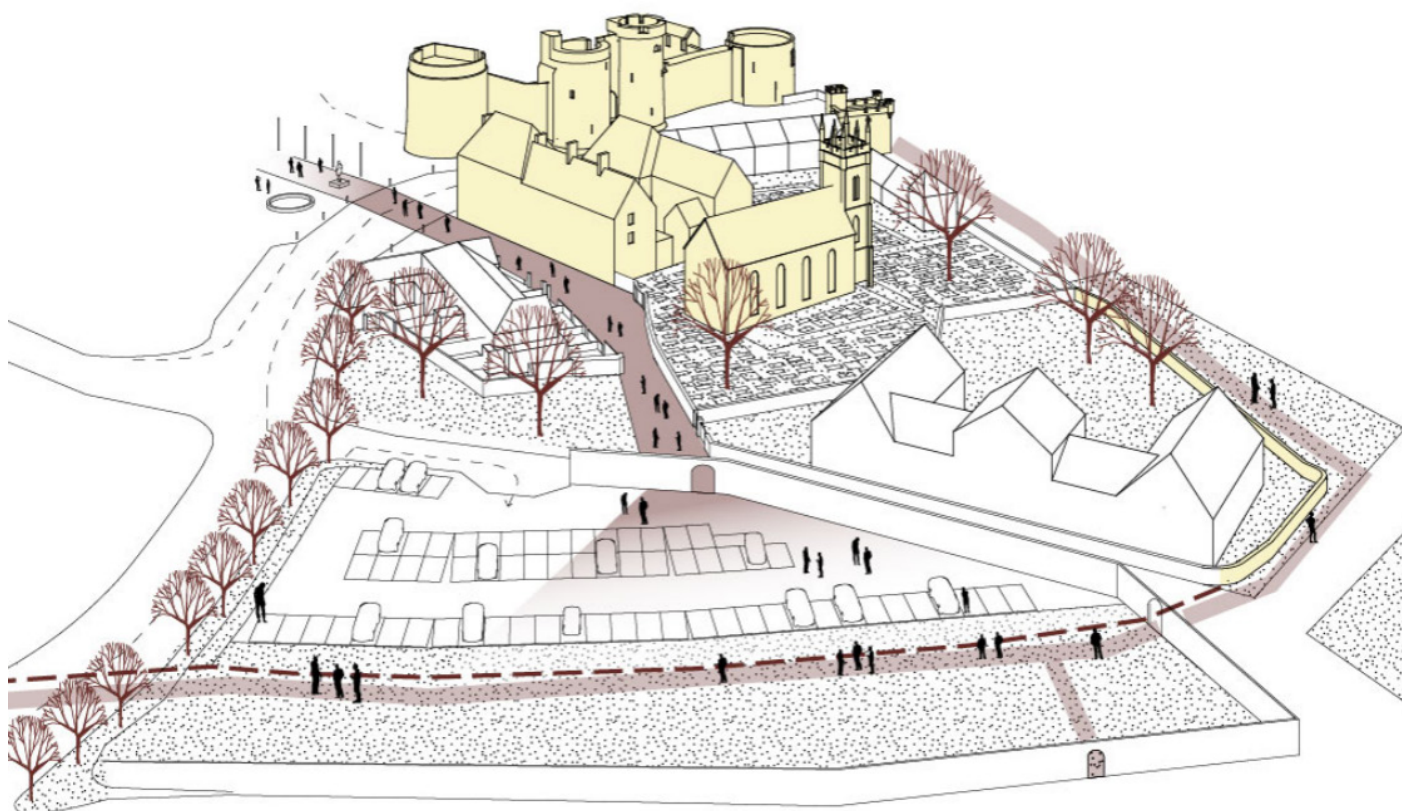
ILLUSTRATE IMAGE OF THE POTENTIAL LAYOUT OF THE ORCHARD SITE
